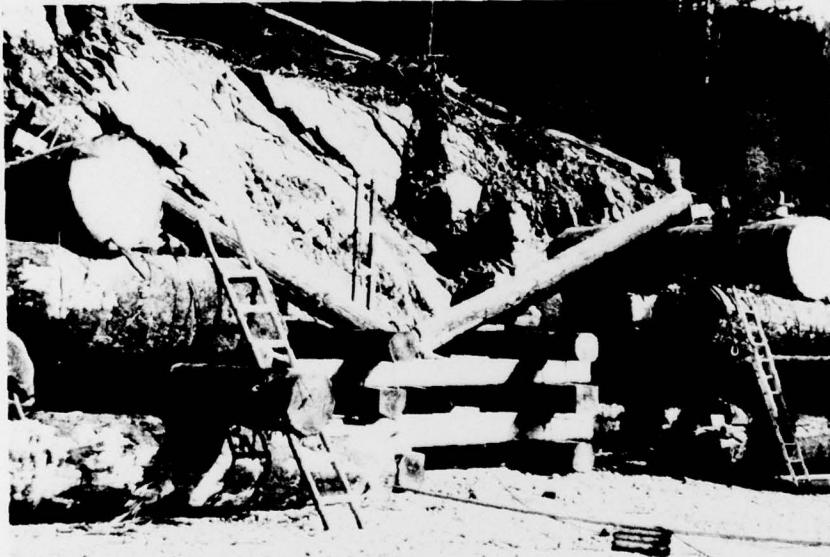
Western hemlock logs, although slightly stronger than spruce, failed abruptly, often falling to the ground.
